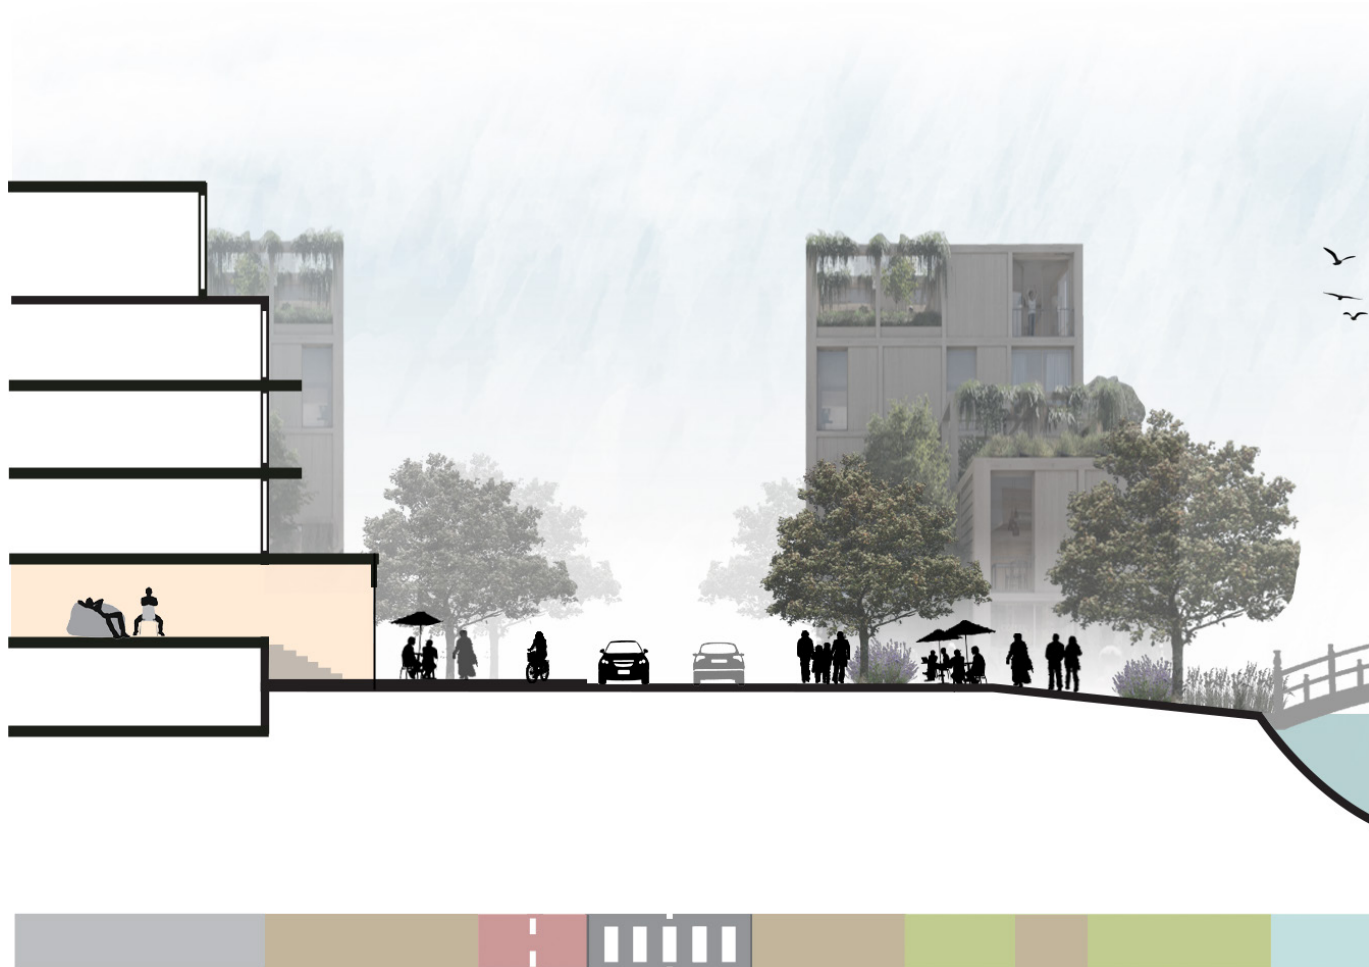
Section 'Neighborhood main street'. Source: made by author
